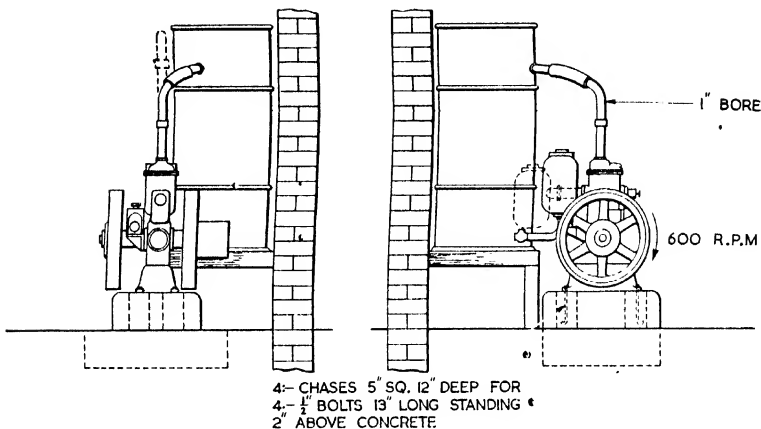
TYPICAL INSTALLATION DRAWING OF A 5-B.H.P. PETROL ENGINE—SIDE AND END ELEVATION
